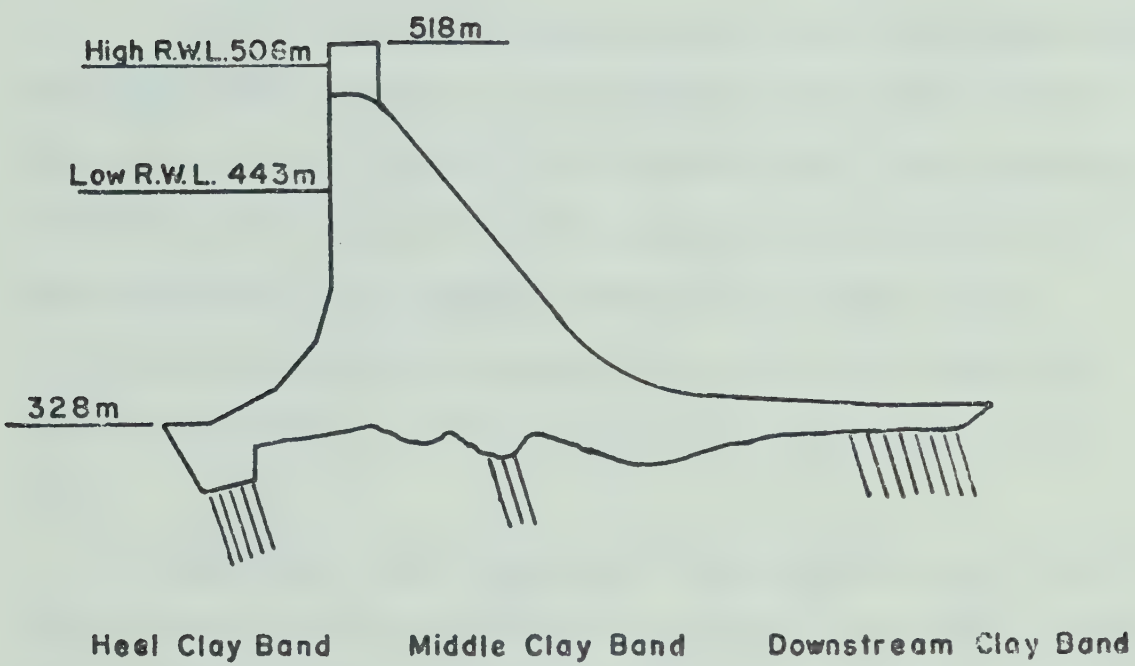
MAXIMUM SPILLWAY SECTION
